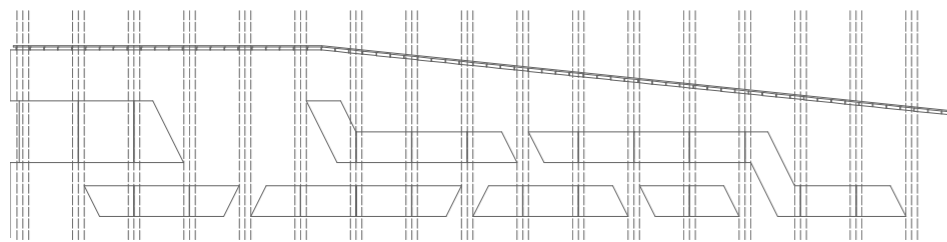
The Vierendeel structure is concealed inside the façade whenever possible.
